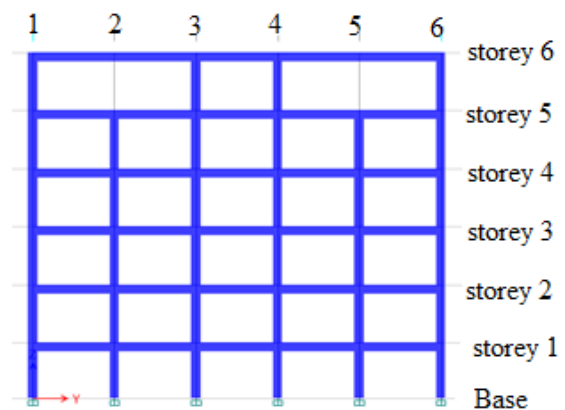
10 Section view of buildings with floating column at parallel position, 4th floor
